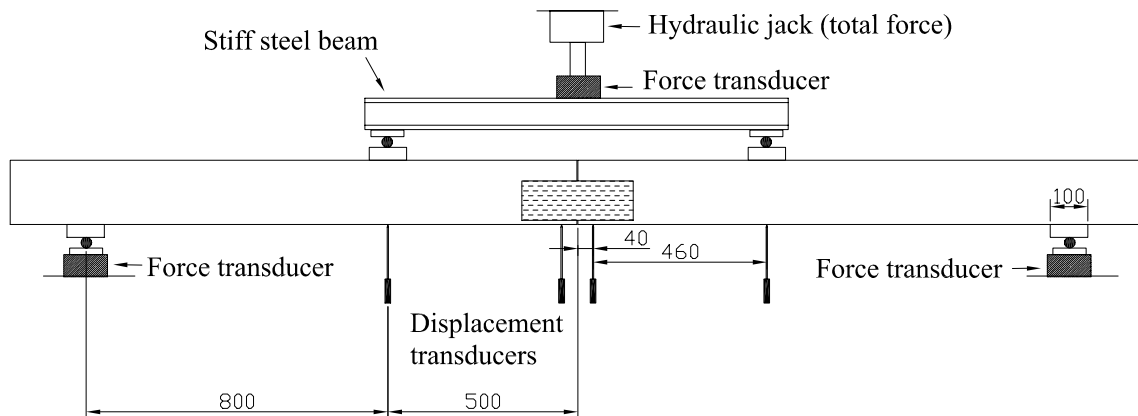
Test set-up for bending tests with splice joints. Dimensions in mm.
